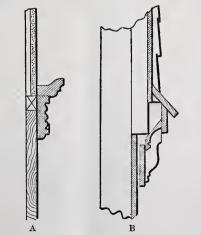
A, Section Through Chalk Shelf, Scale, 1½ Inches to the Foot; B, Section Through Belt Course Across Side Gable, Scale $\frac{3}{4}$ Inch to the Foot.
